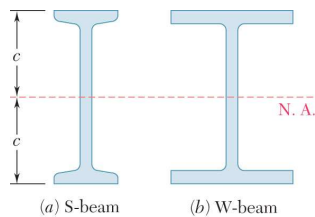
Two type of steel beam cross sections. (a) S-beam and (b) W-beam
